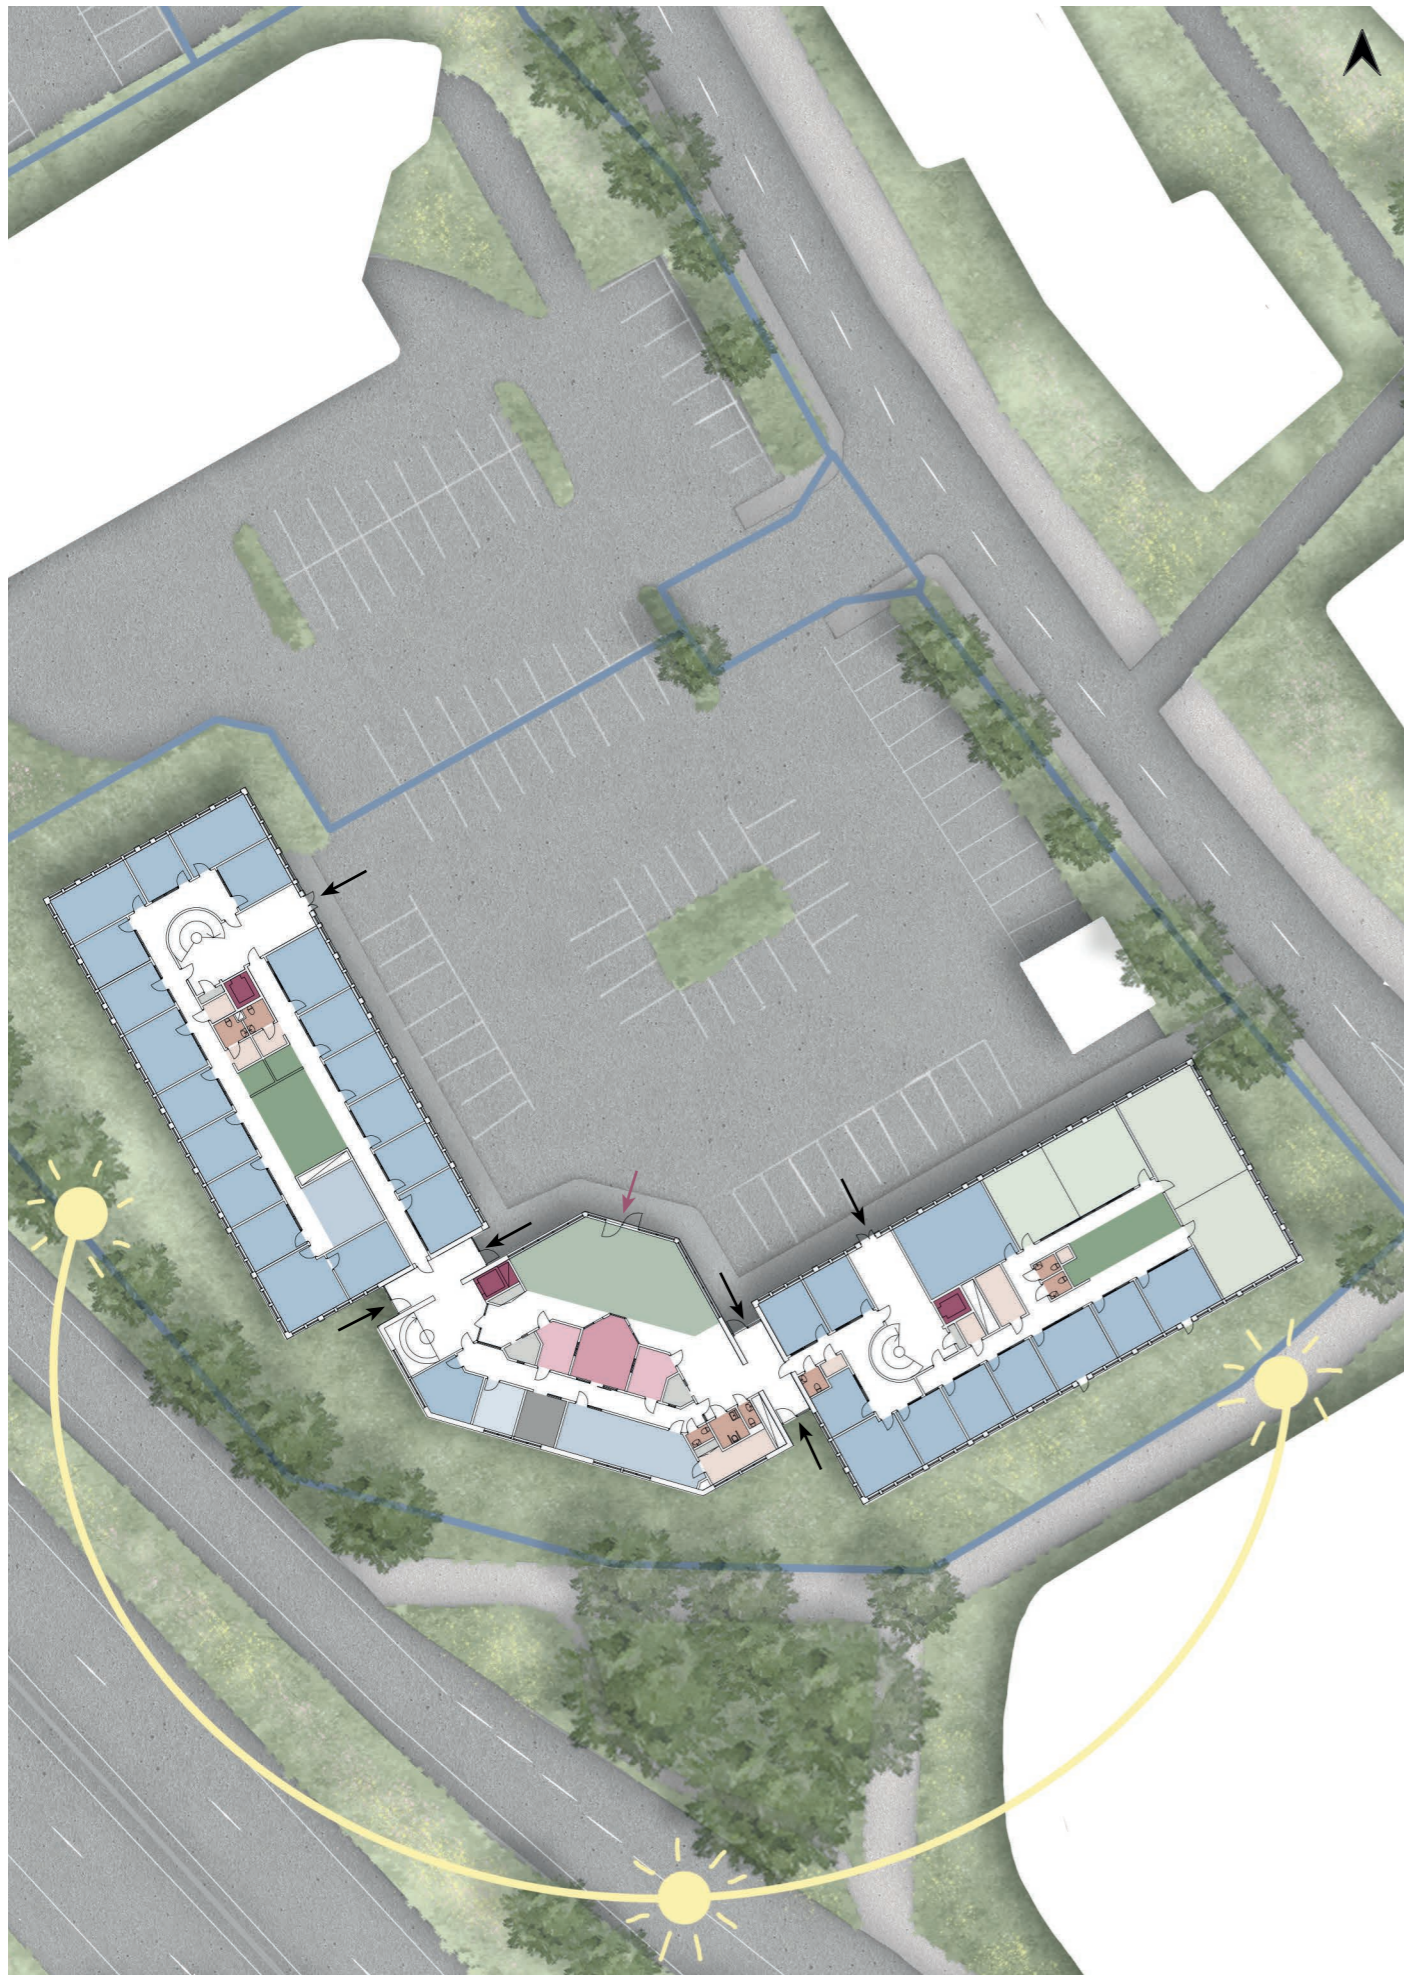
Floor plan existing situation, first floor (1:500 A4).
